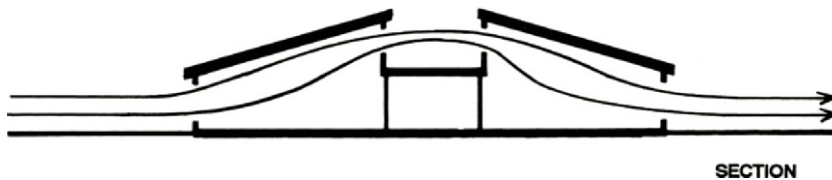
e In single-story buildings, a double-loaded corridor plan can use clerestory windows instead of transoms for cross ventilation.
